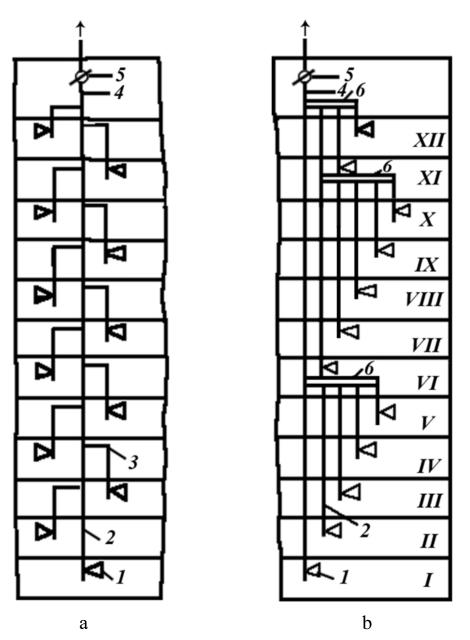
Arrangement of Natural Ventilation Channels in Multi-Storey Residential and Public Buildings (Scheme):
